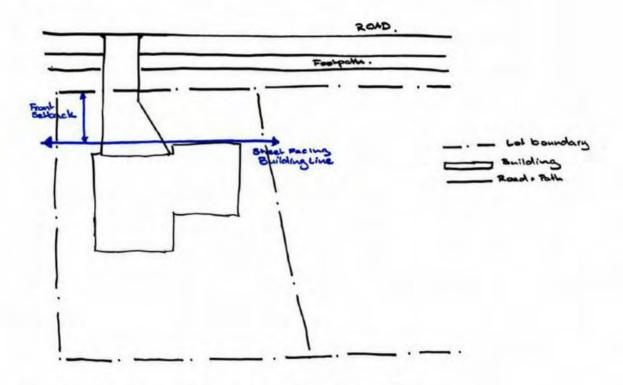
Front Building Line / Street Facing Building Line & Front Setback
